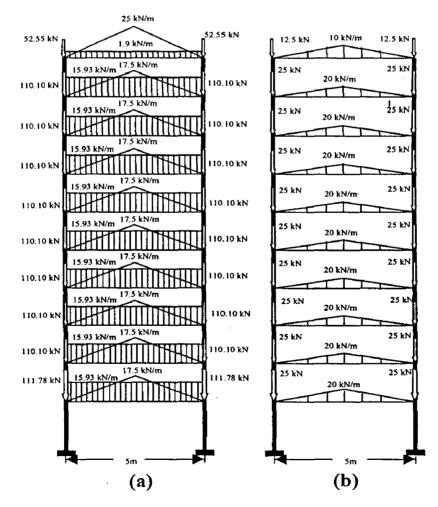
(a) Dead load on one-bay plane frame (b) Live load on two-bay plane frame
